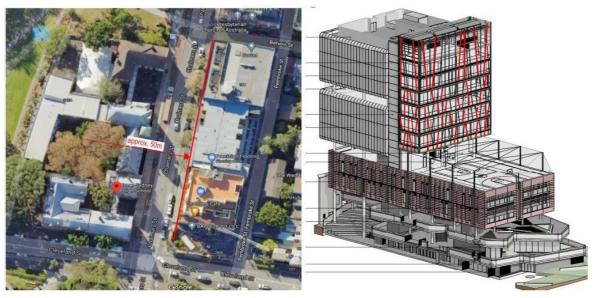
façade lighting effects are shown in red on the northern elevation and eastern and western returns of the building In terms of operational factors, the following considerations are of relevance:
